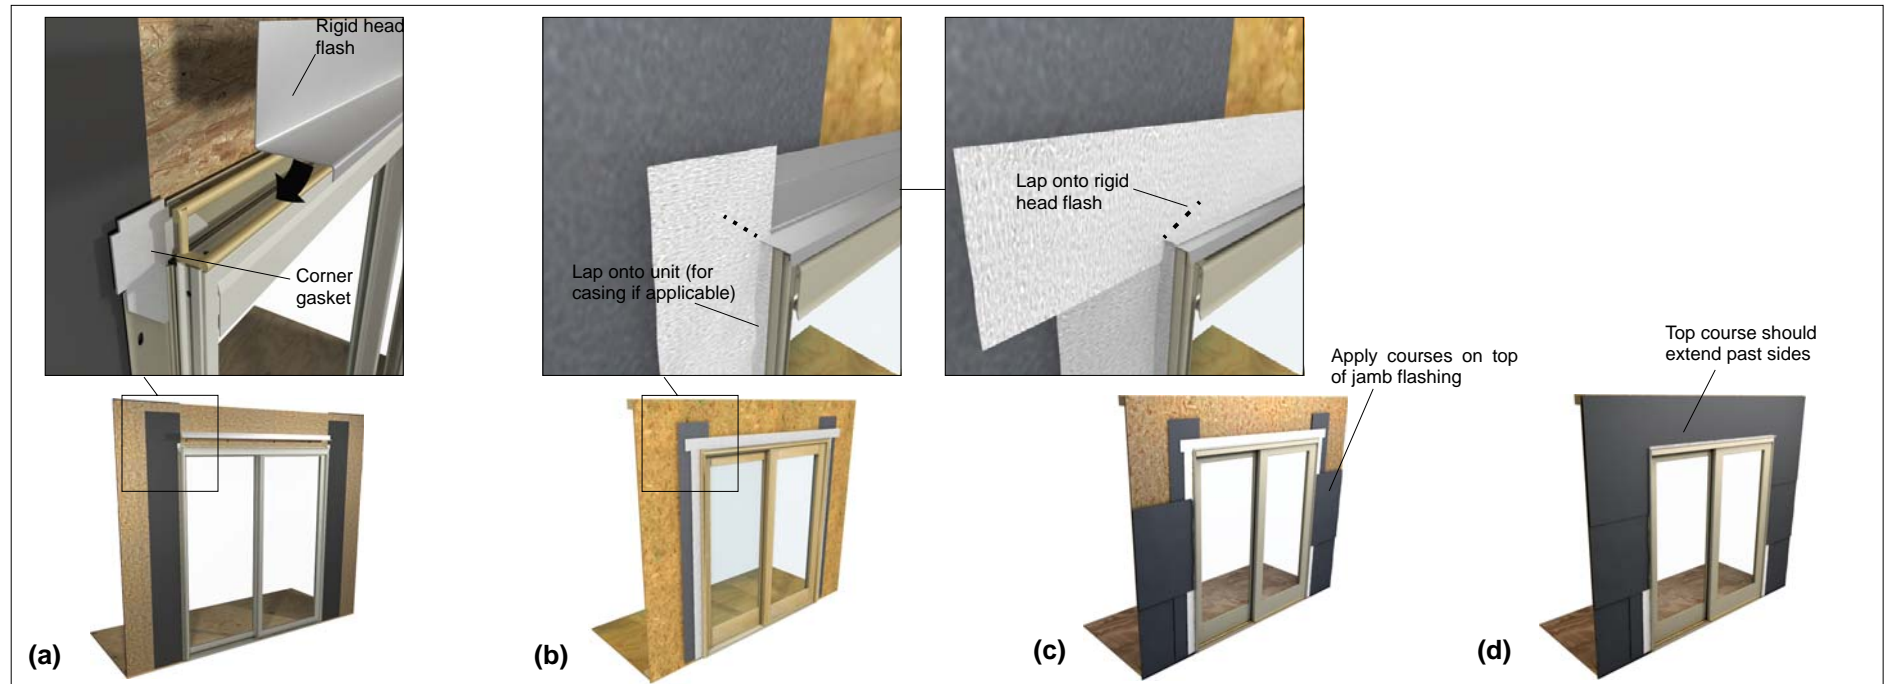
Flashing the installation (Sliding door shown but applies to swinging door as well.)
